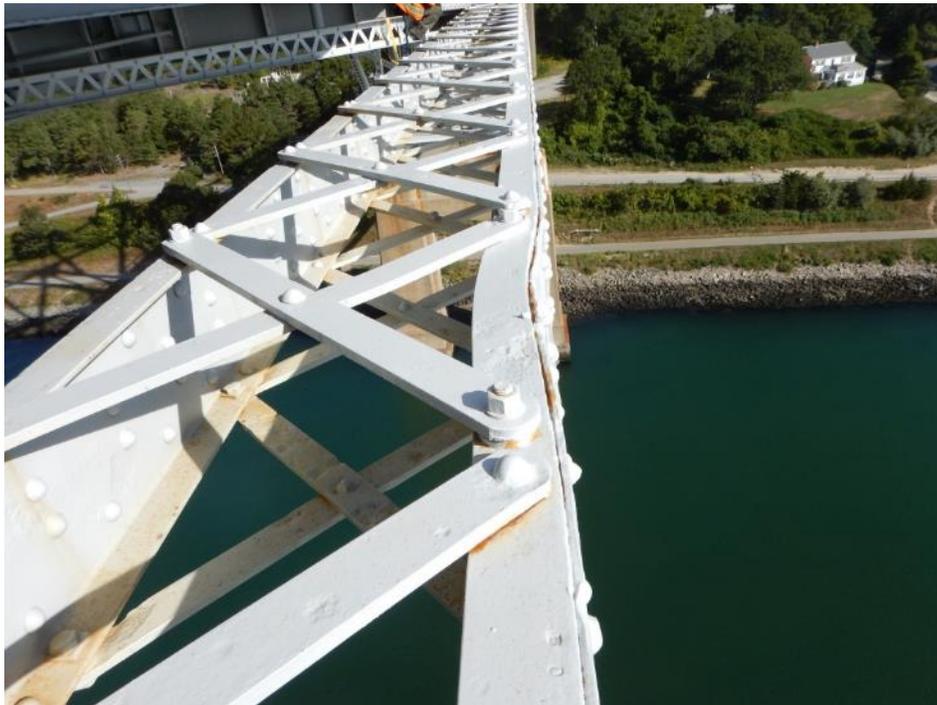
Sagamore Bridge, impact damage to the east wind chord.
